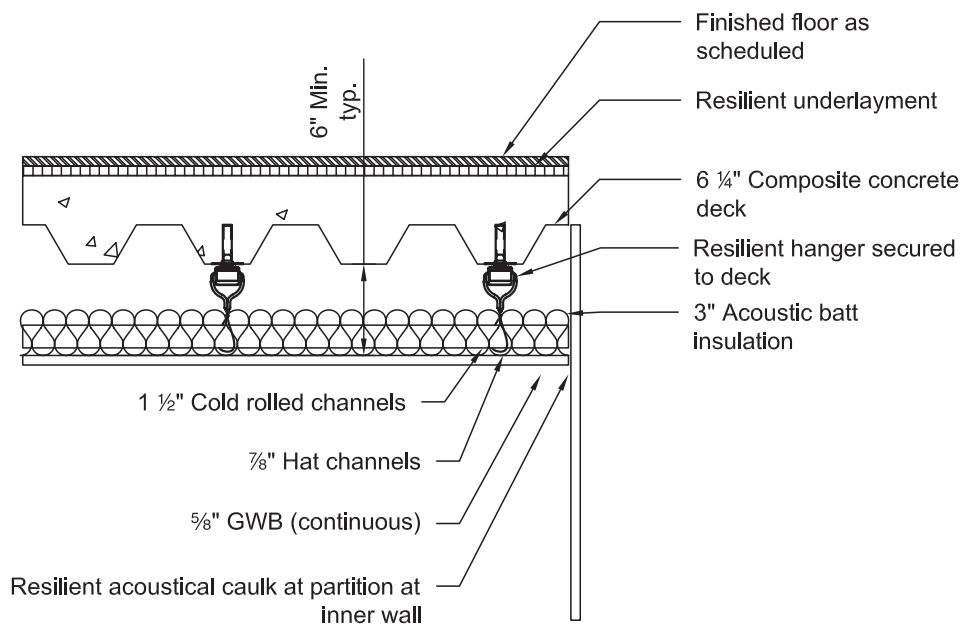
Composite metal/concrete deck with neoprene ceiling hanger and floors on a resilient underlayment.
